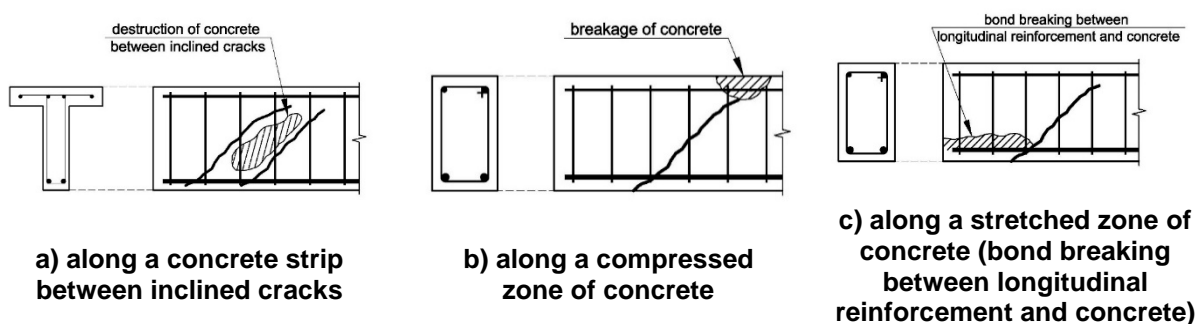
Schemes of a reinforced concrete element destruction along an inclined section
